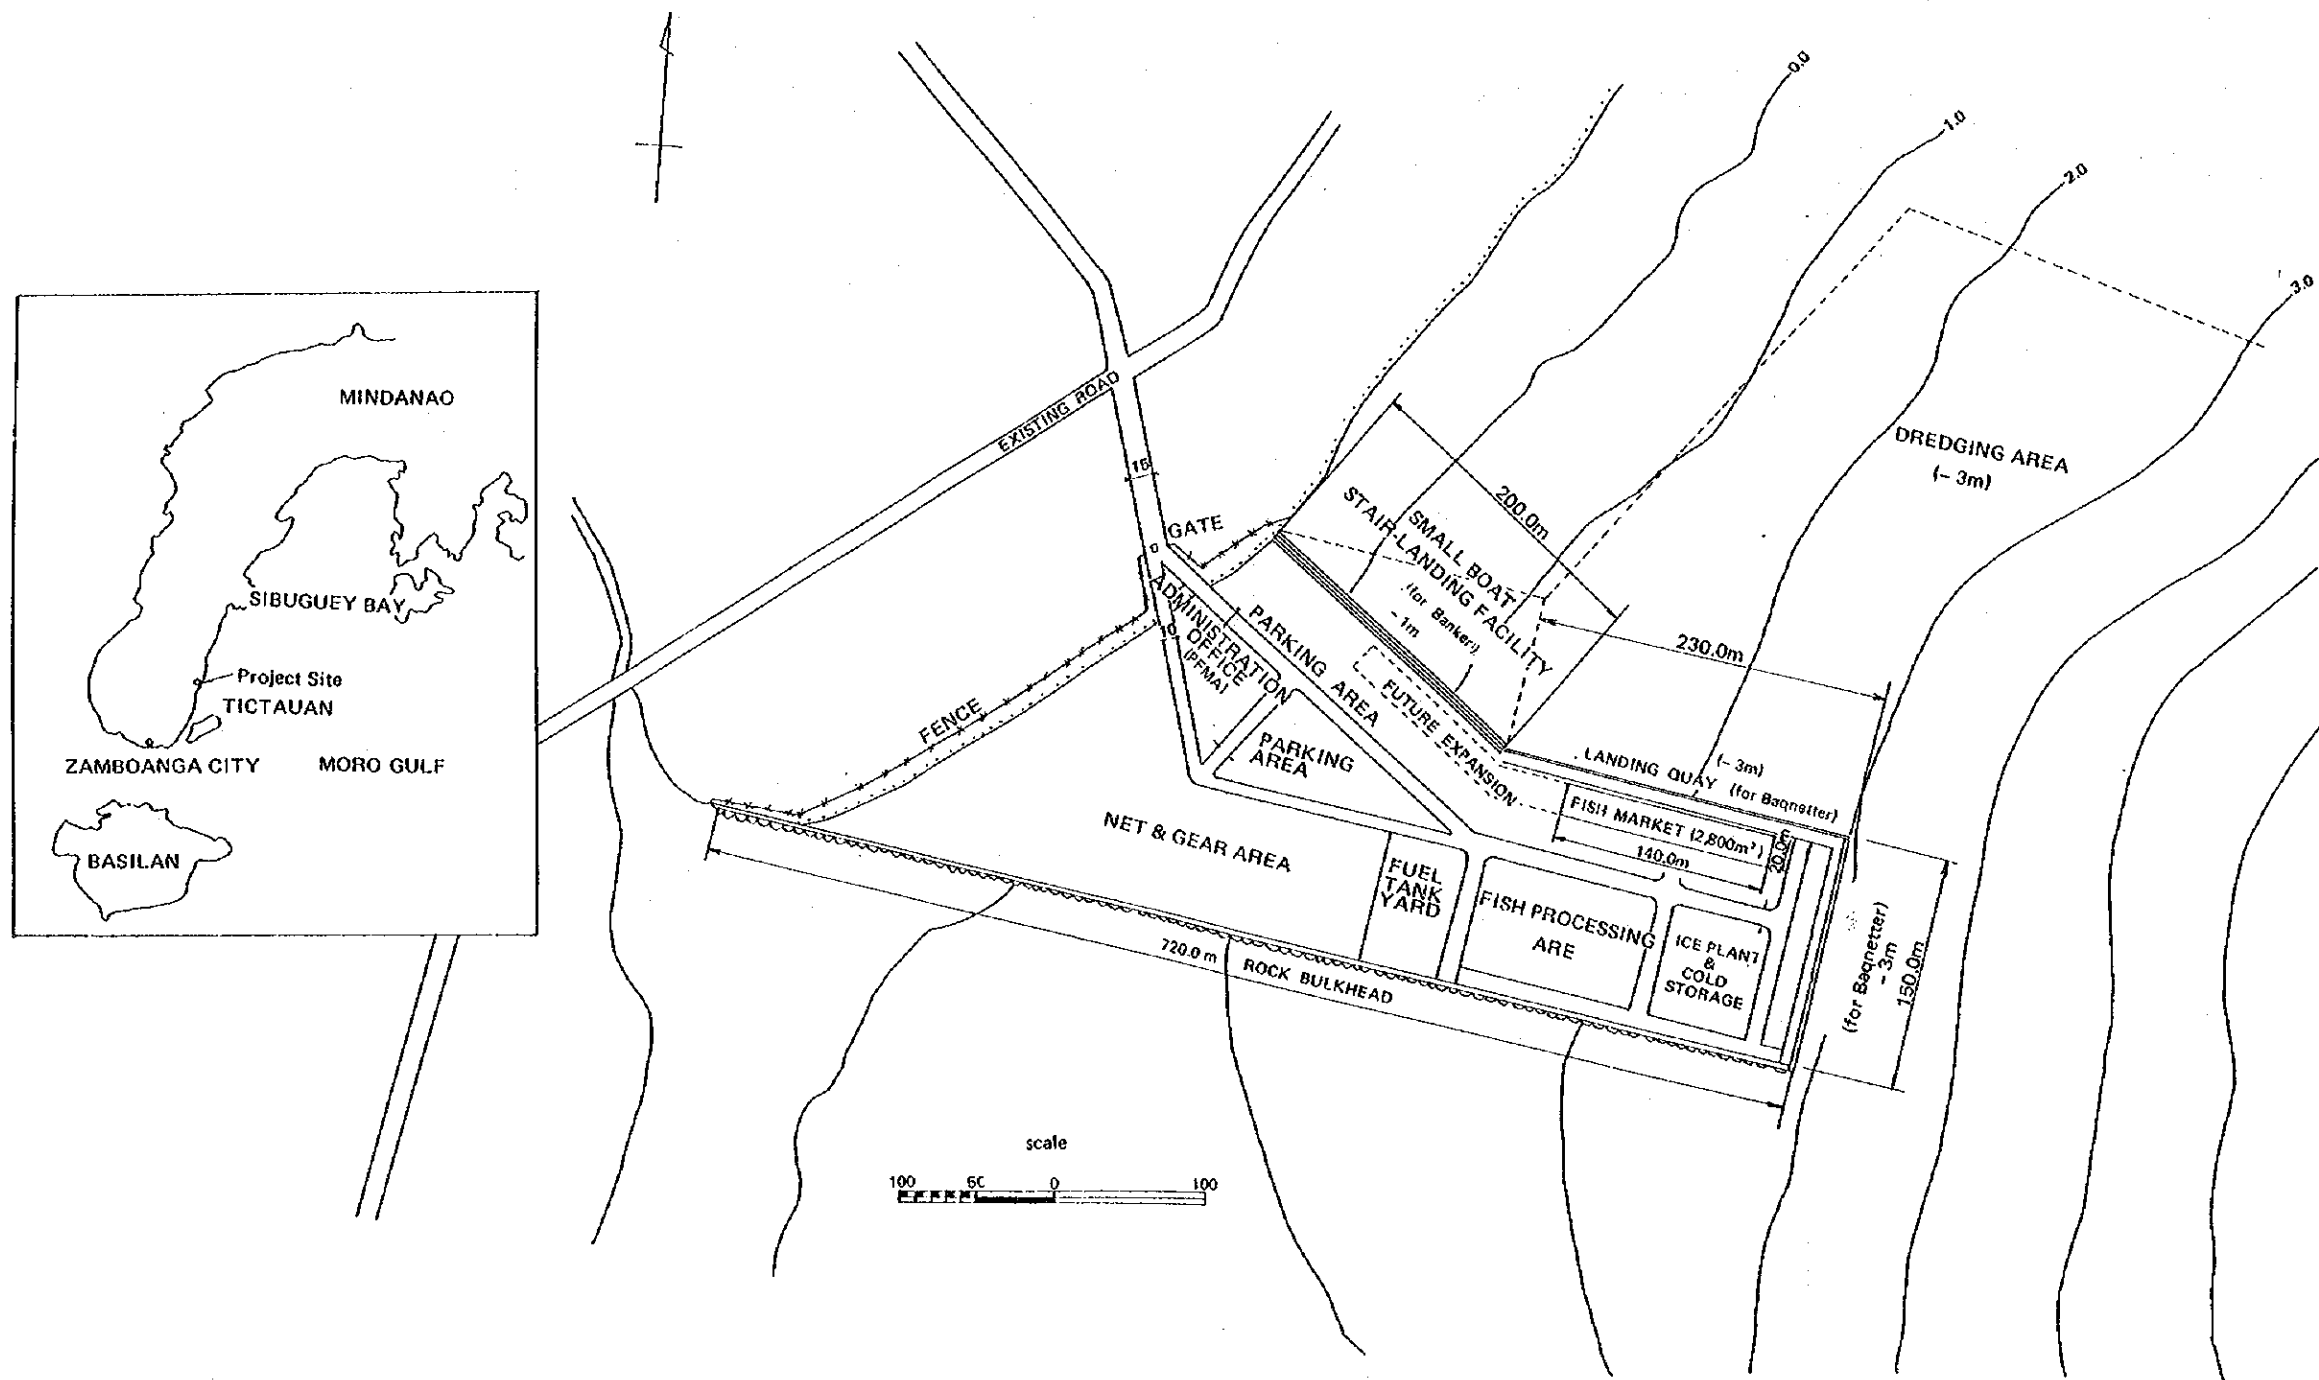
Master Plan of Zamboanga Fishing Port
